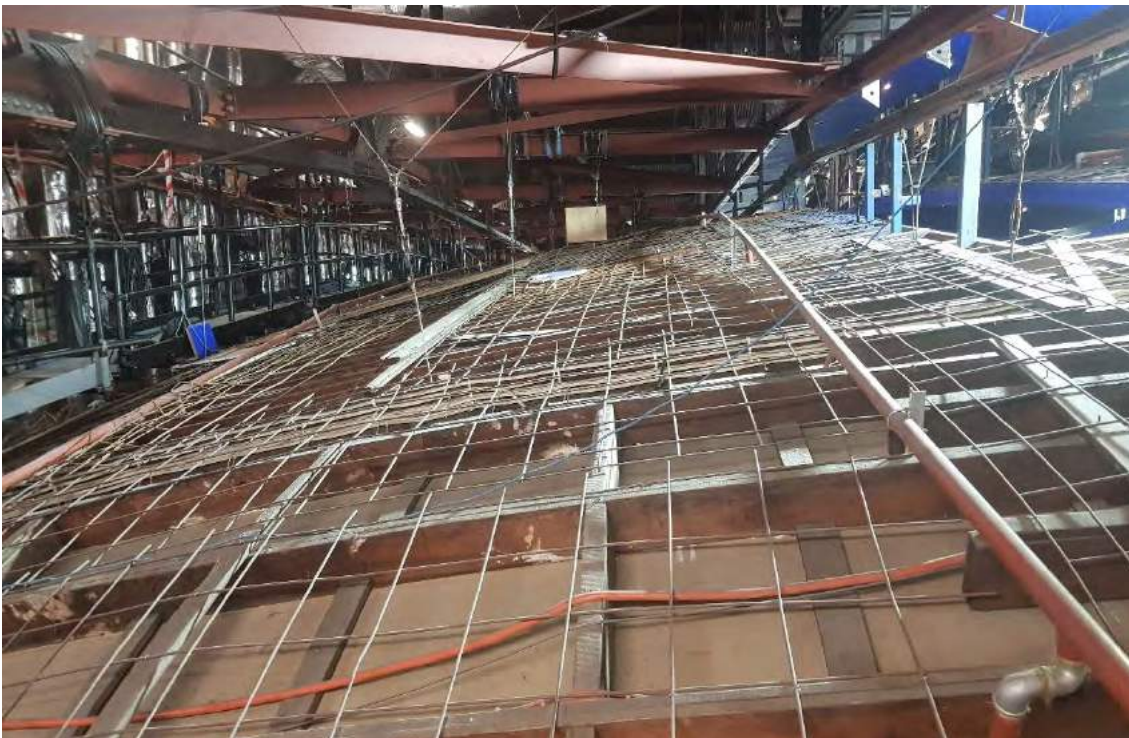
Original Theatre Roof – Hanging Timber Ceiling
